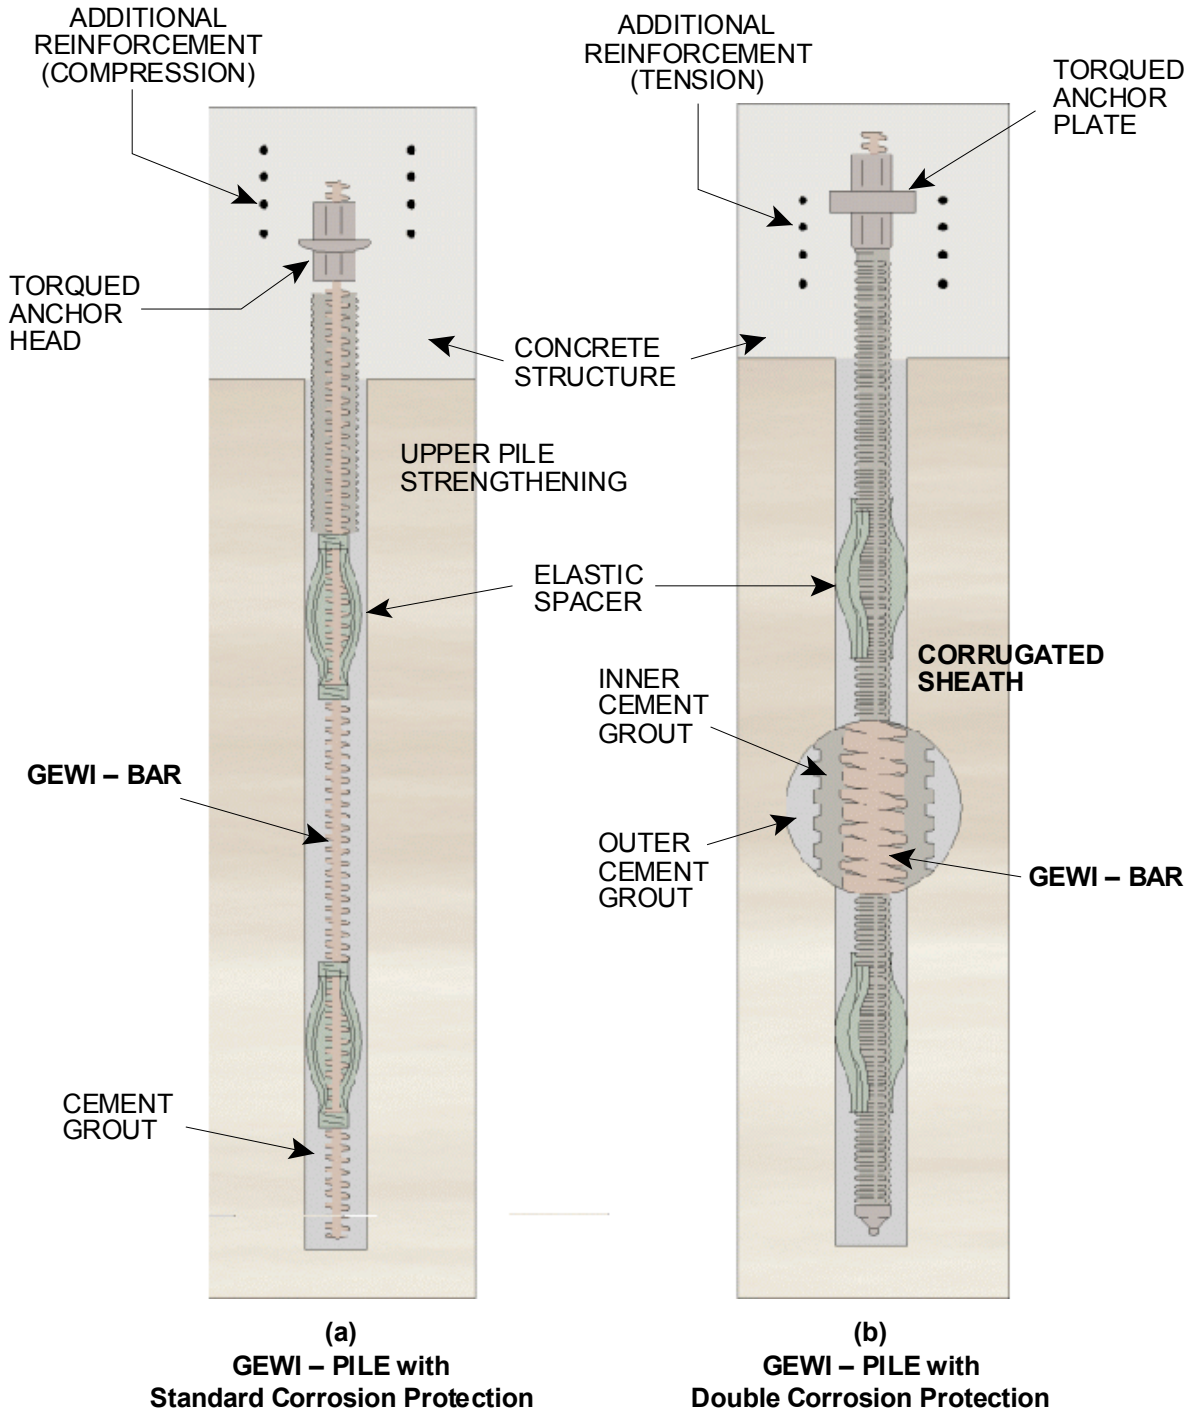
GEWI Piles with (a) Grout Protection only; and (b) Double Corrosion Protection (Courtesy of DSI).
